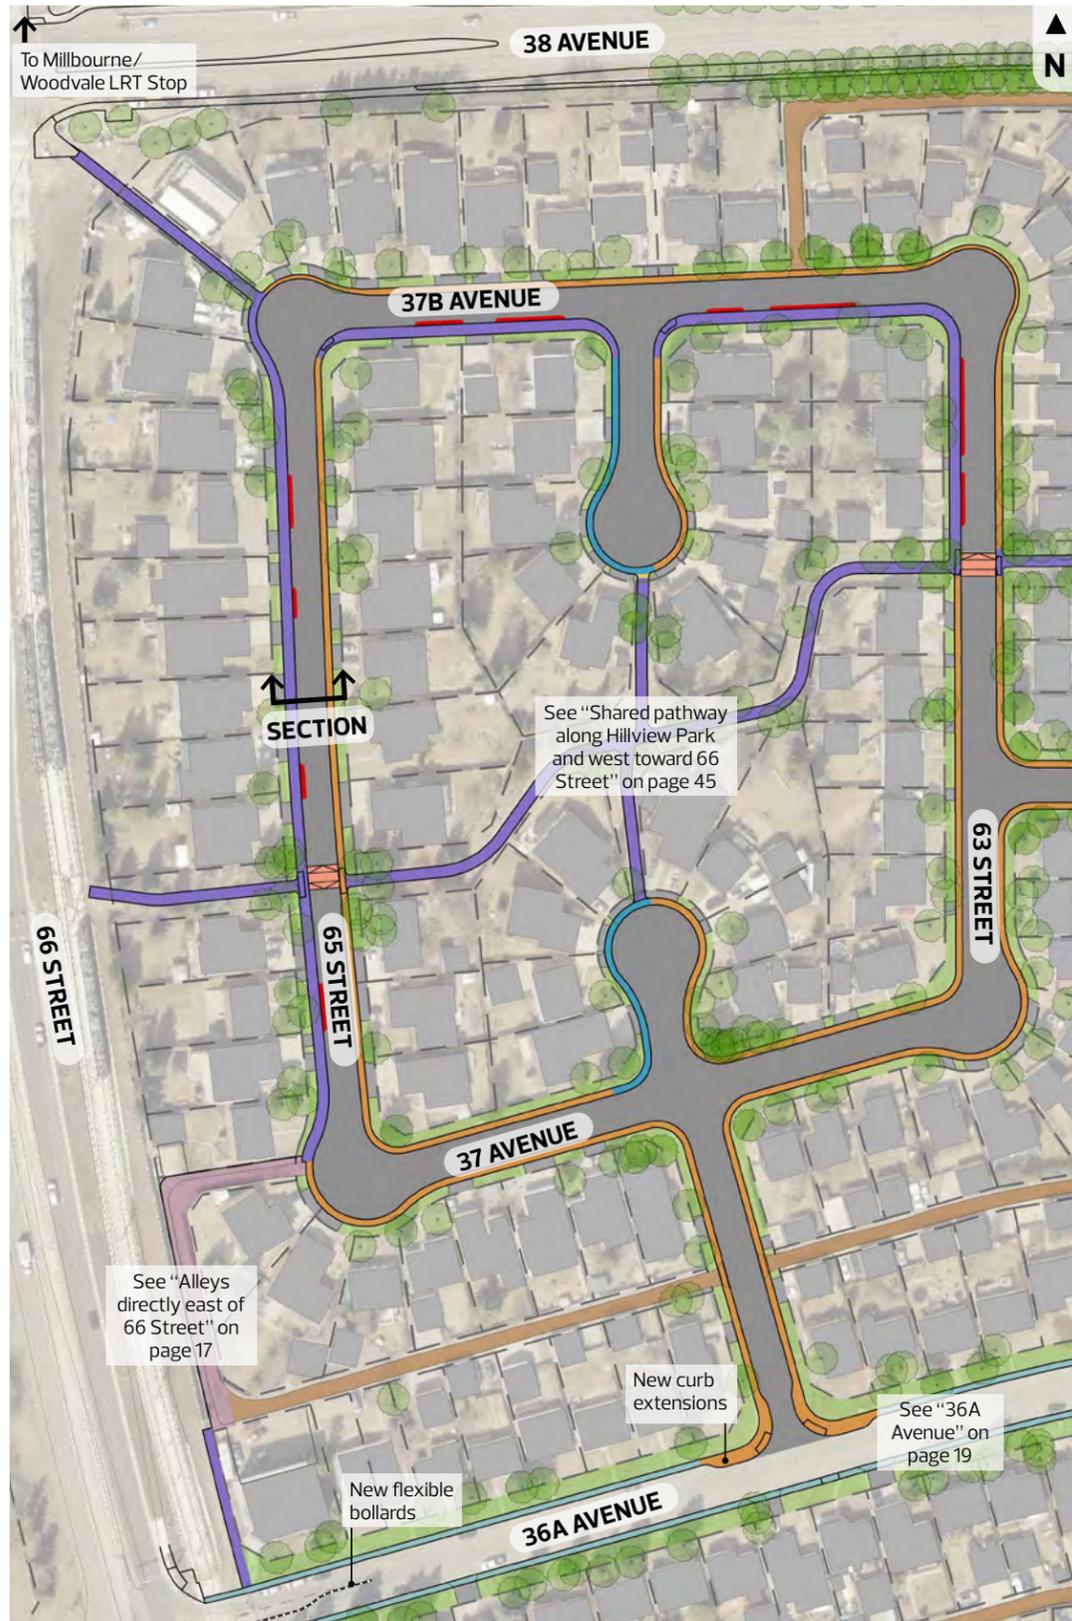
65 Street, 37B Avenue and 63 Street – Plan view
